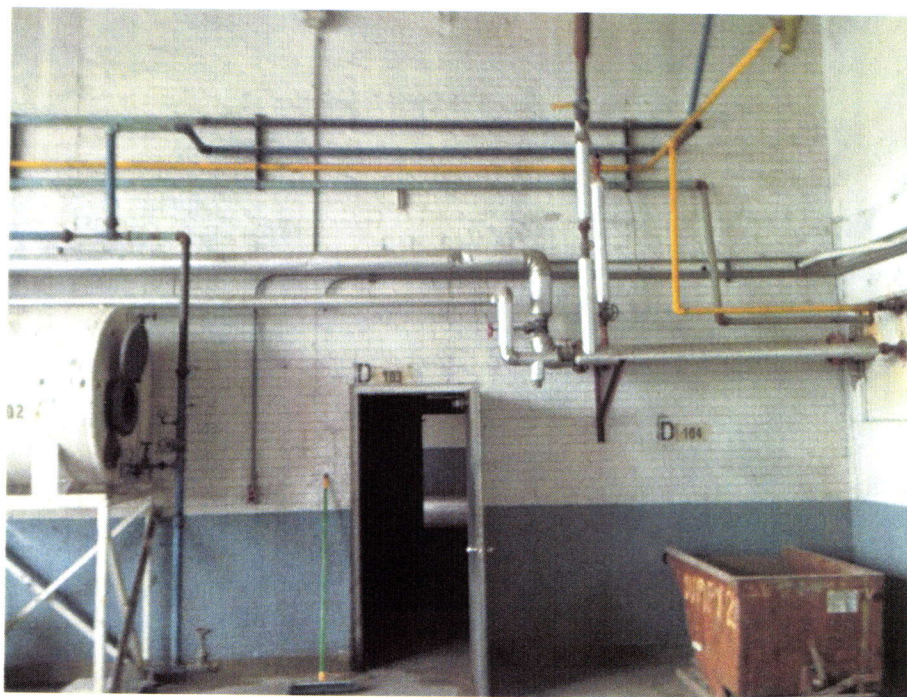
West wall of survey Unit D1 showing the entire wall being comprised of painted red-clay brick.
